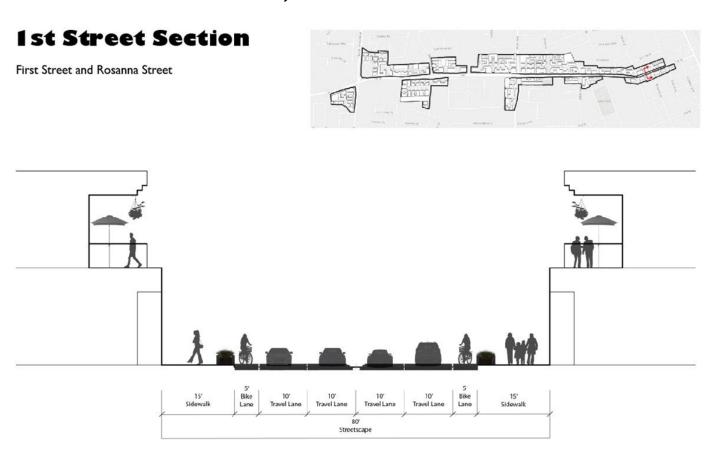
1st Street Section at Rosanna Street illustrating the multi-modal oriented streetscape.
